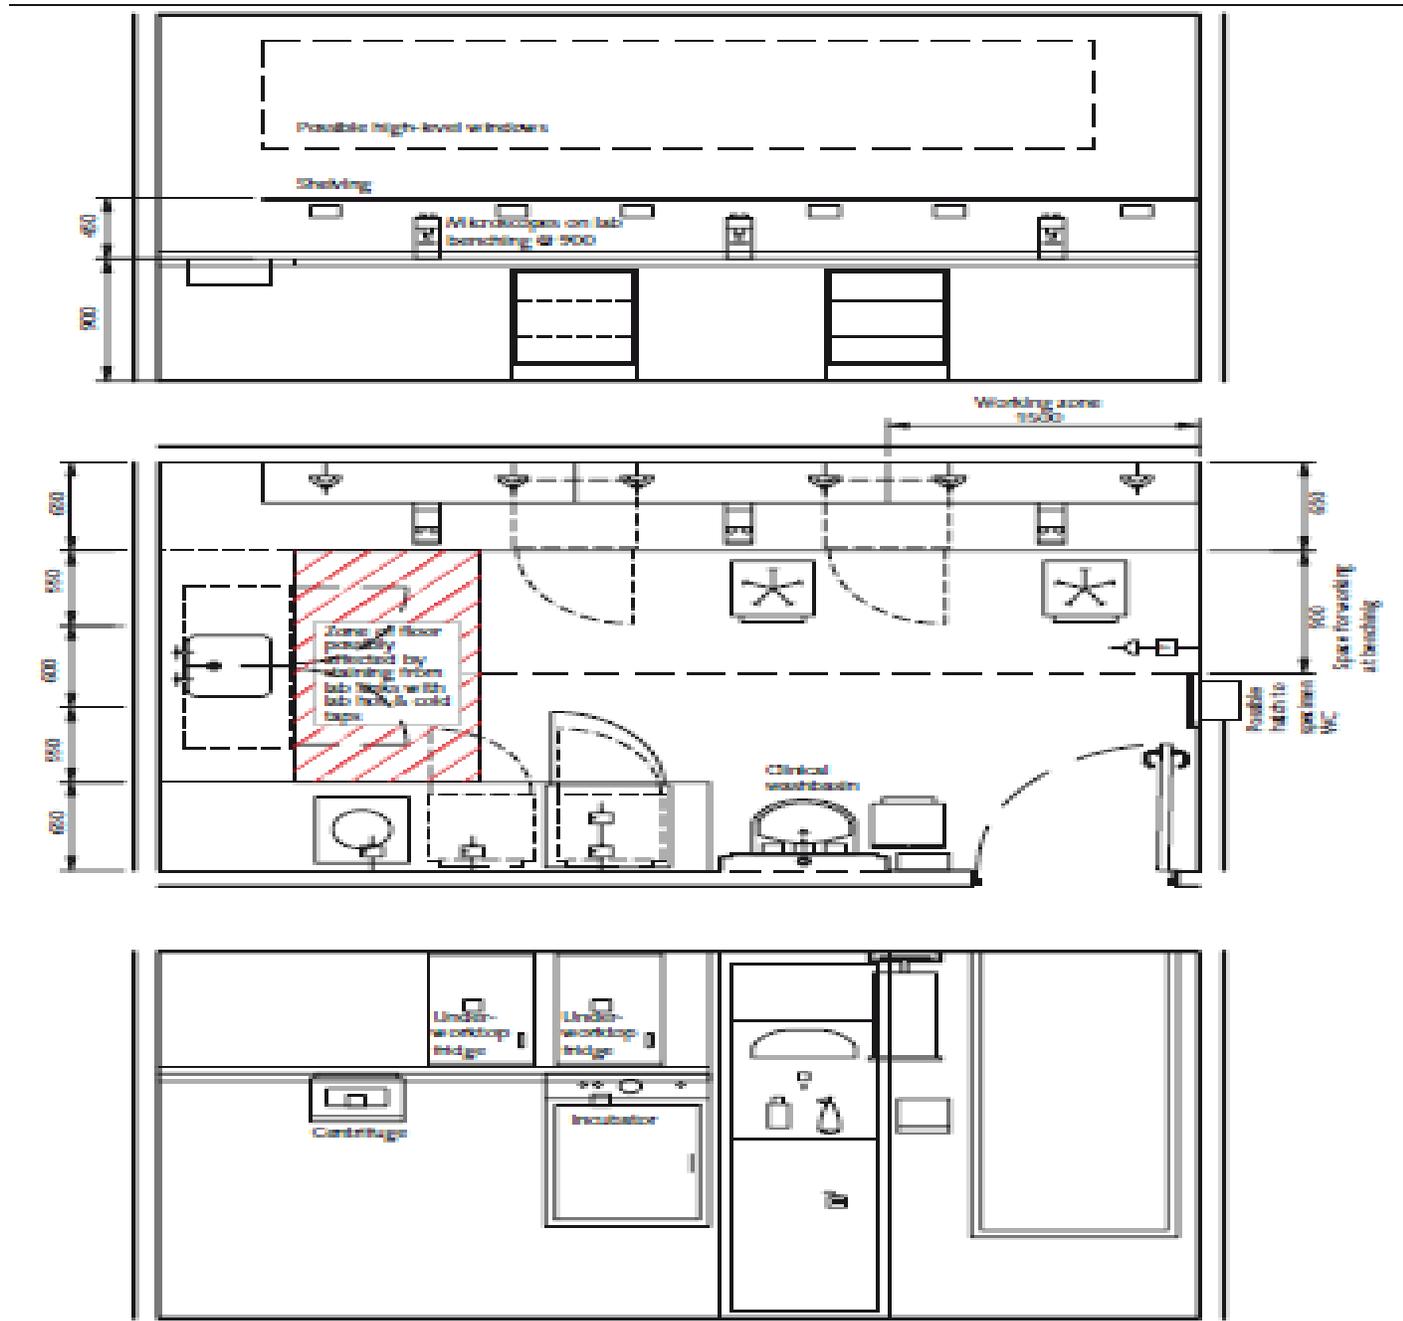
Laboratory and Diagnosis Design Facilities Layout: Source: Department of Health Estates and Facilities Division, (2007)
